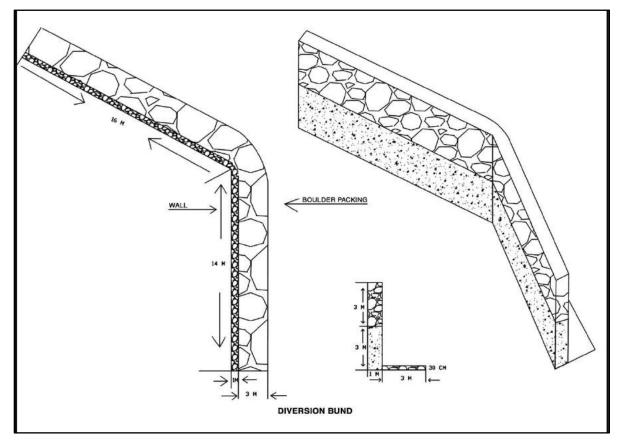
Section of the hydraulic barrier to protect the foundation
